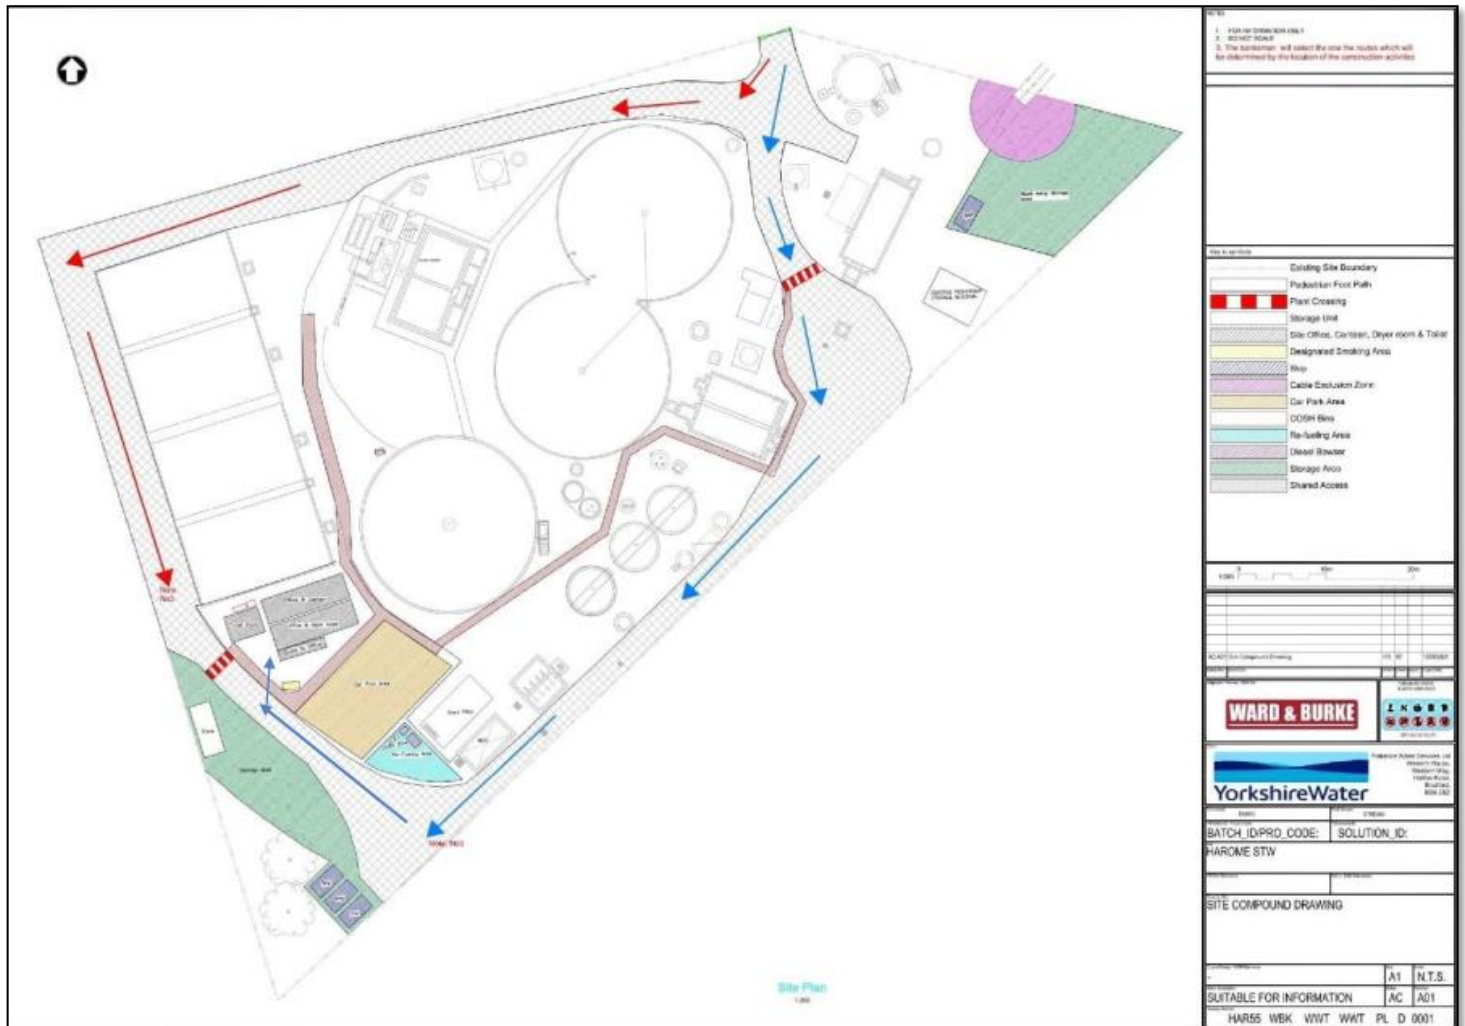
Location of signage for approaching traffic in relation to site entry point
